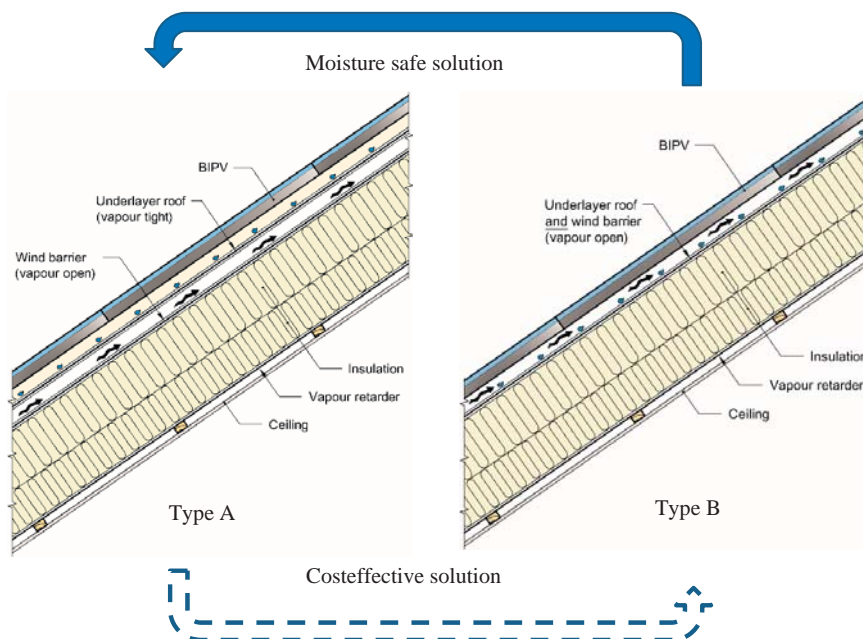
By introducing BIPV the construction sector seems to choose "the previous traditional" way of building a roof structure (Type A). Type B shows the roof construction using a combined underlayer roofing and wind barrier.
